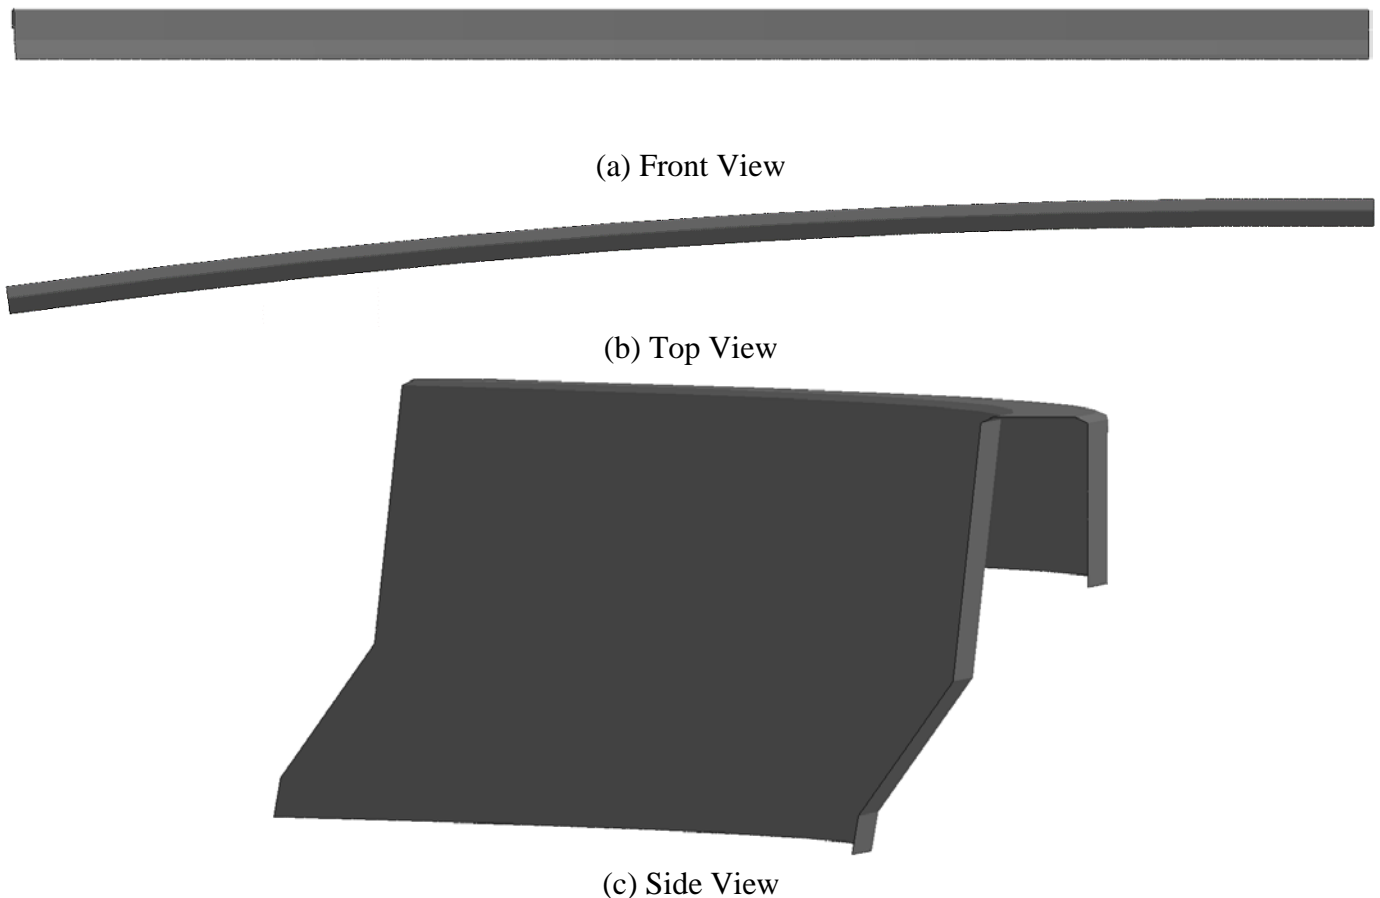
32-inch Tall New Jersey Shape Concrete Barrier FE Model.
